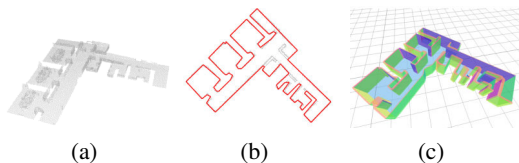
(a) Examples of floor plans for a 3D point cloud of a building's interior. (b) A 2D vector contour around the horizontal point cloud slice, and (c) an extruded 3D mesh representation of the primary 2D floor plan boundaries based on the generated vector contours.
